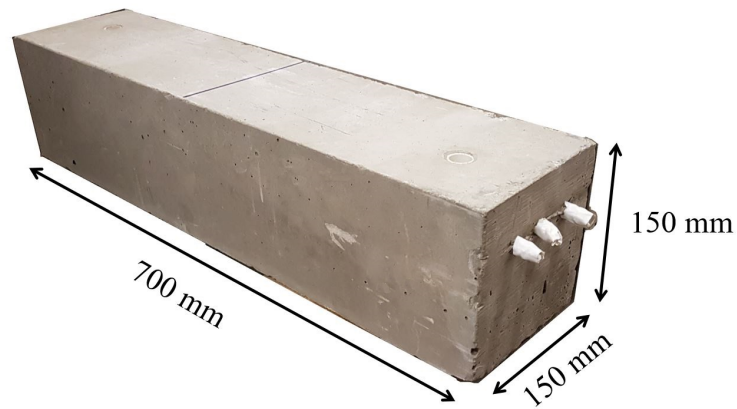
Typical 150 x 150 x 700 mm concrete specimen
